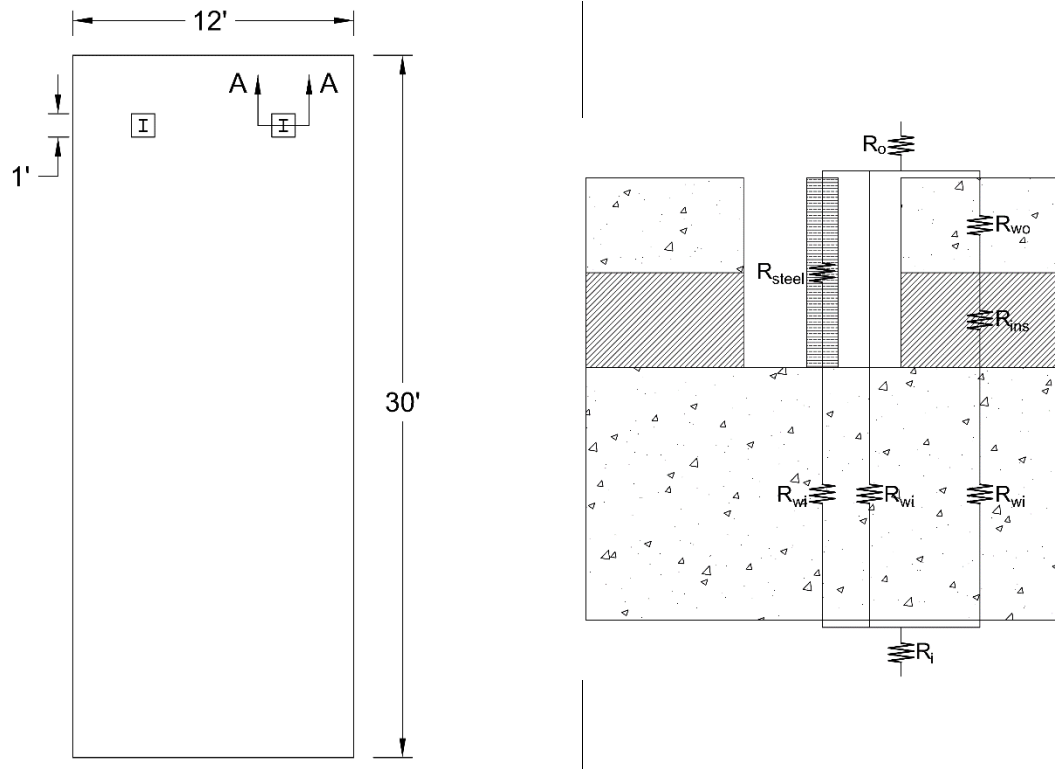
Penetration without replacing blocked out material example panel layout and cross-section with electrical circuit analogy
